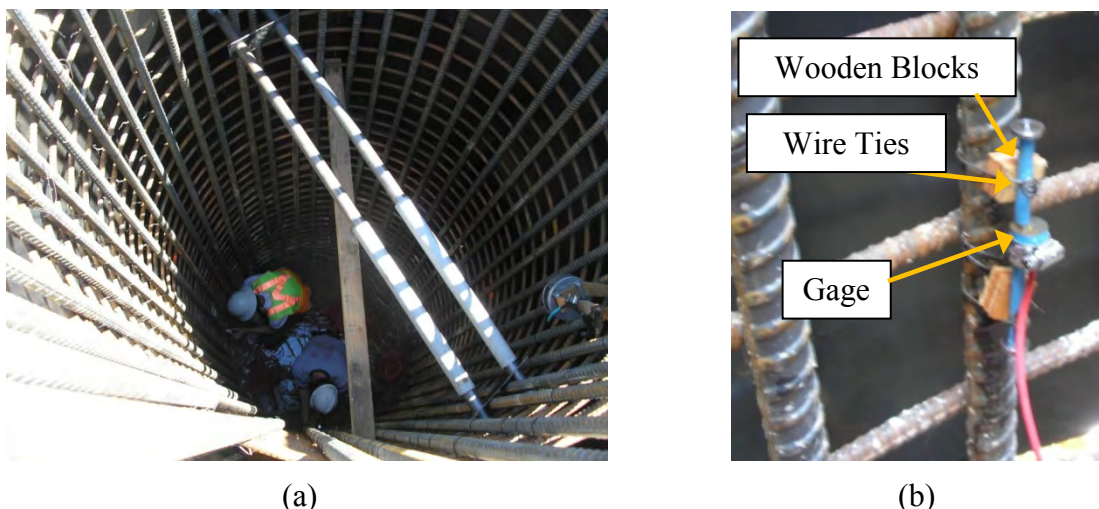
Pier Column Strain Gage at Stockbridge Bridge: (a) Gage Installation; and (b) Gage Attached to Reinforcing Bars
